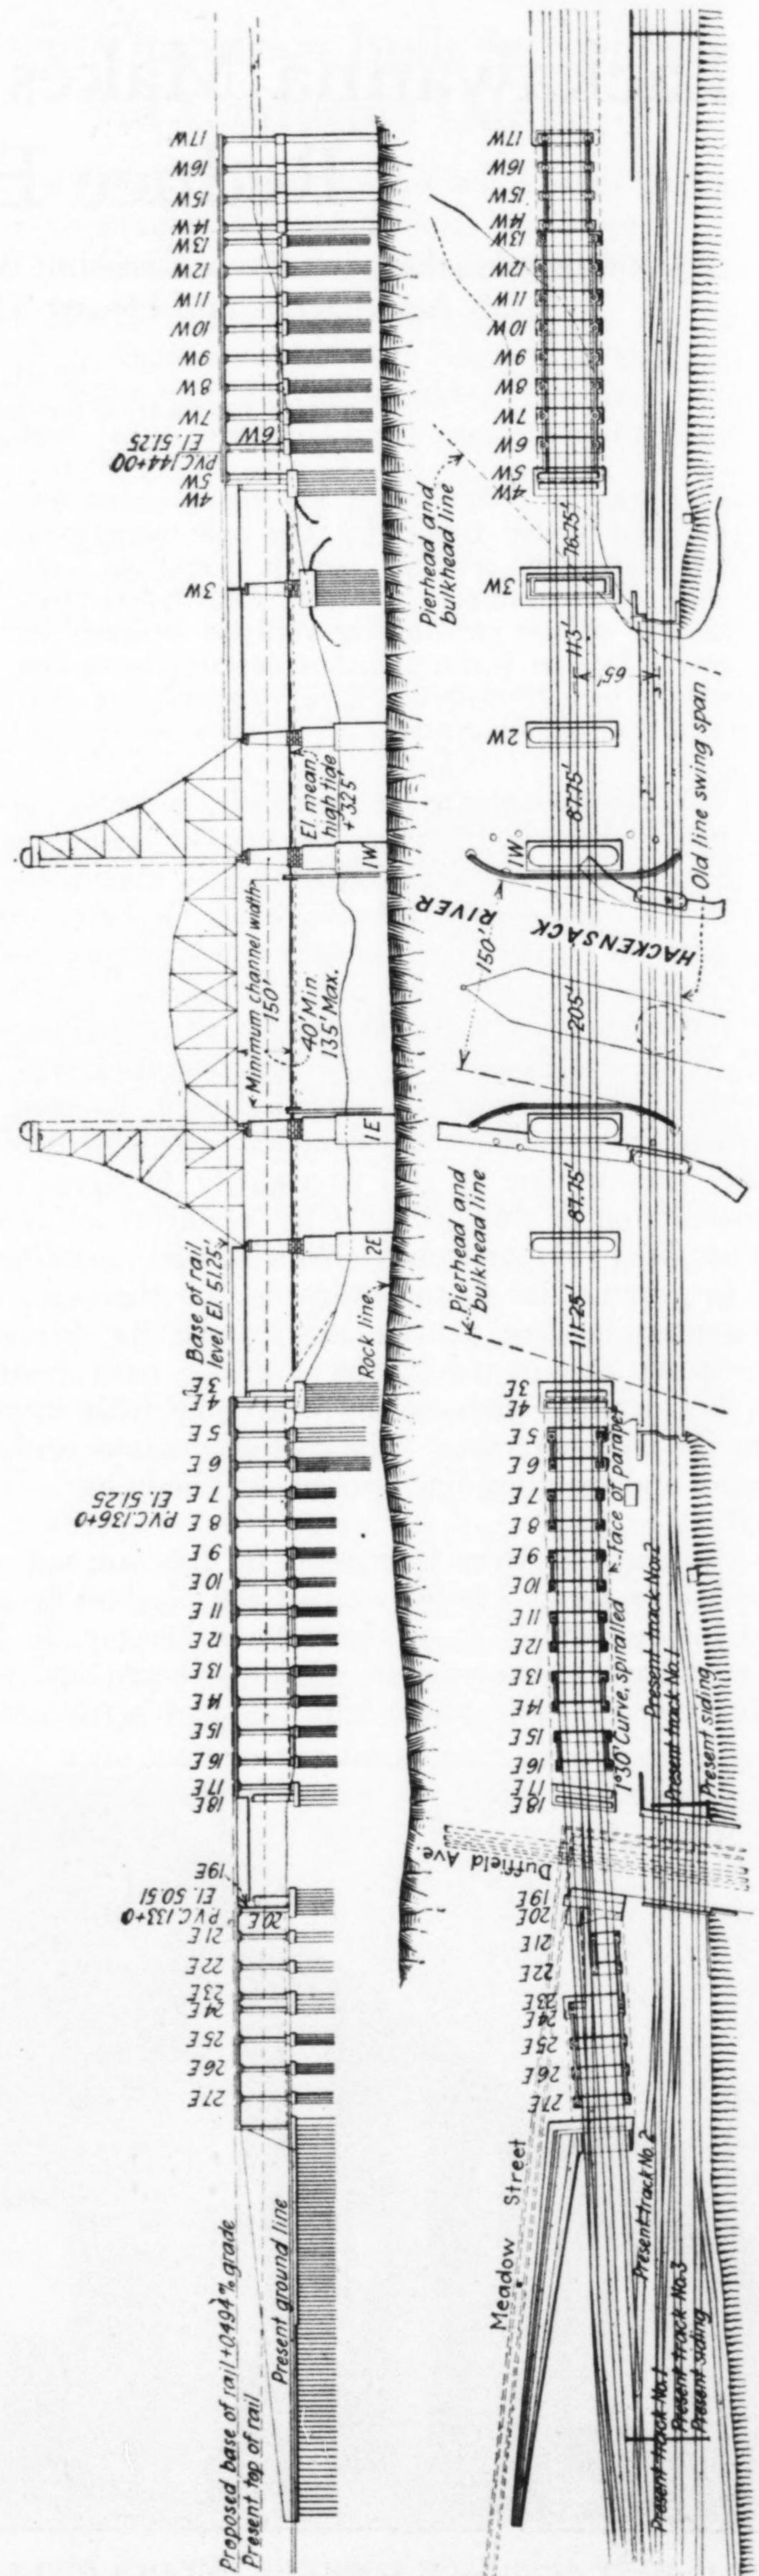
GENERAL PLAN AND PROFILE OF HACKENSACK RIVER CROSSING
